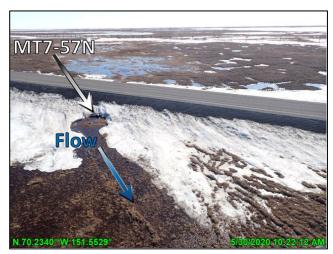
Flow through culvert MT7-57, looking south; May 30, 2020
